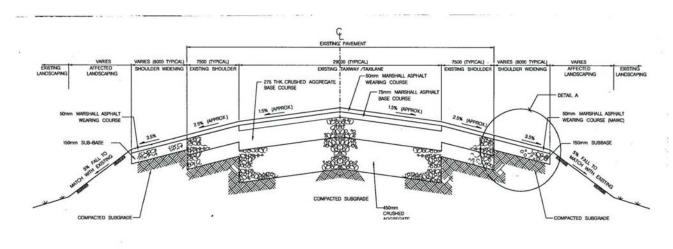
Typical Taxiway Shoulder Widening Cross Section
